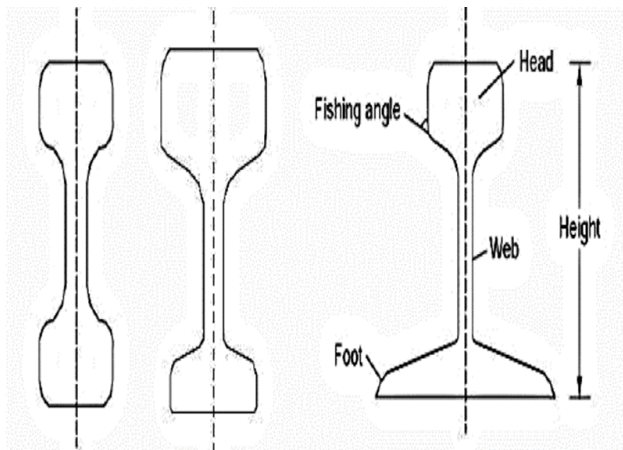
Double-headed Rail, Bull Headed Rail, Flat Footed Rail
